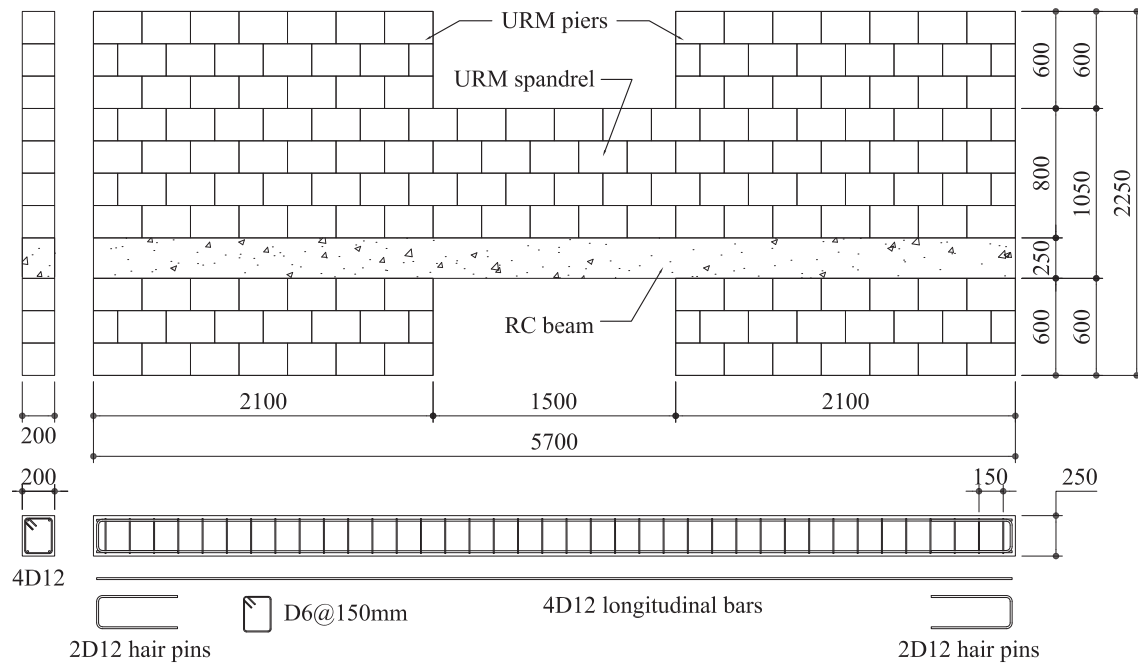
Composite spandrels: Dimensions of the test units and reinforcement layout of the RC beams. The longitudinal reinforcement varied according to Table 1.1. All dimensions are in [mm].
